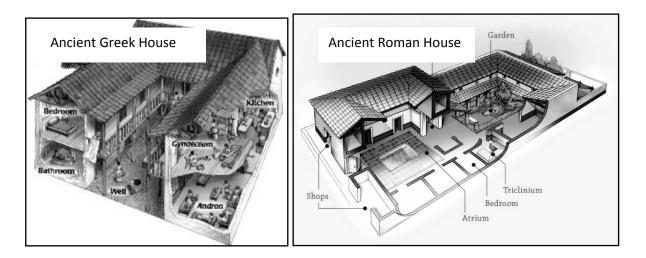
2: Typical ancient Greek house (left picture) and typical Roman house (right picture)
